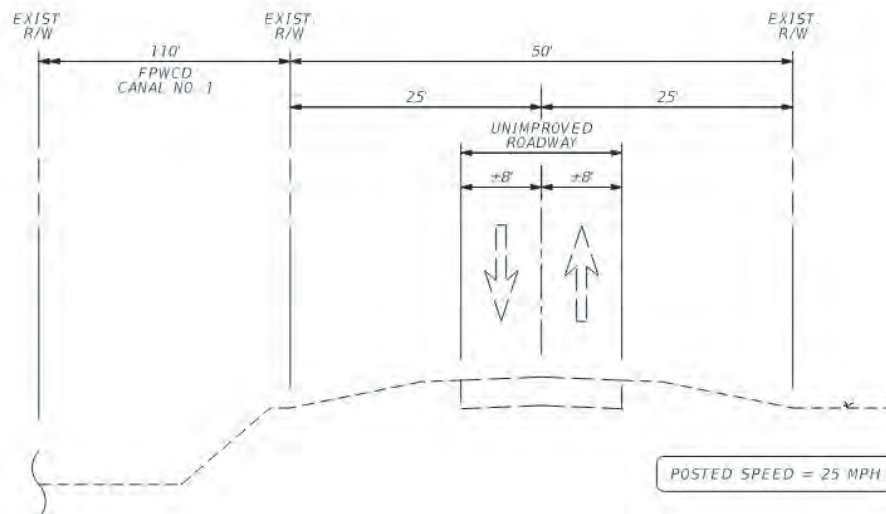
C: Seminole Road Existing Typical Section – North of Immokolee Road
